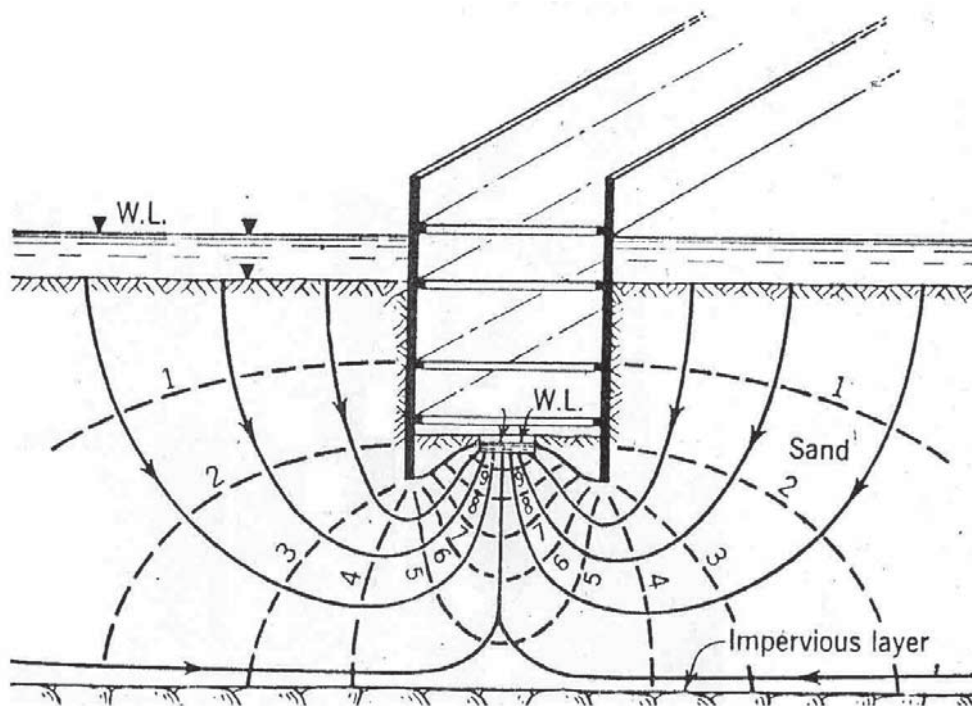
Sheet piling and Open Pumping (Leonards, 1963)
